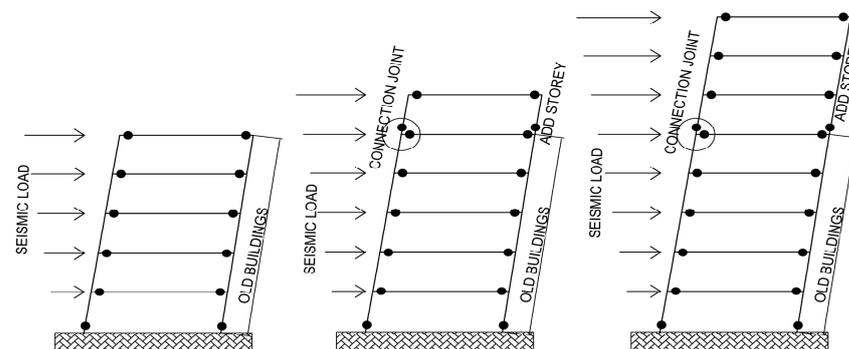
Display of the plastic cracks on the old building and the building with added floors.
